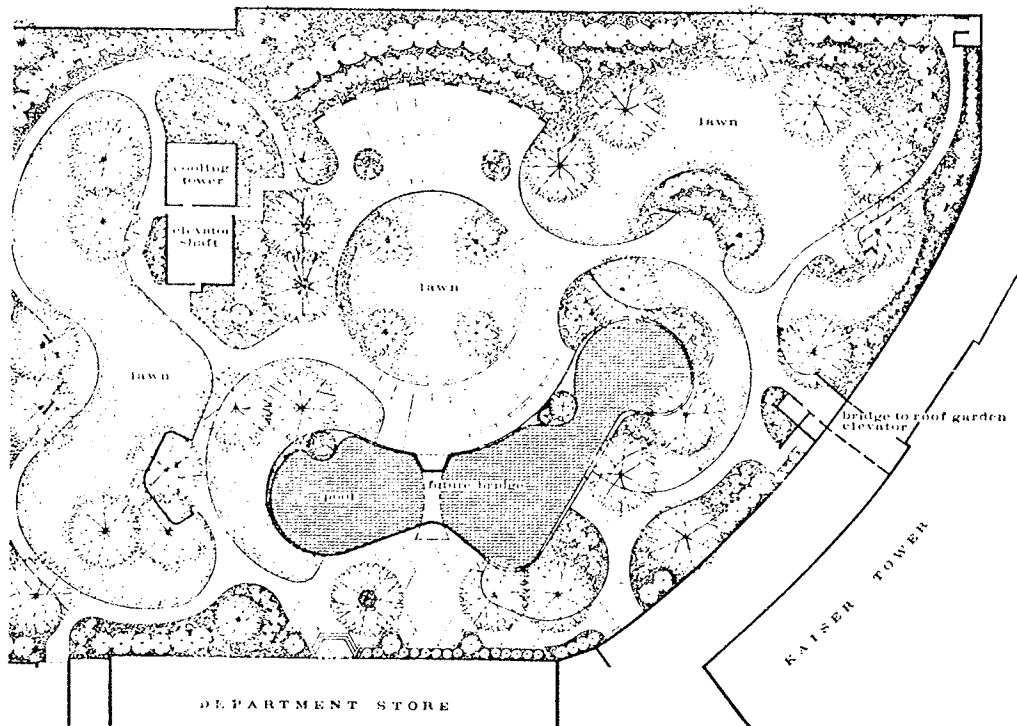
Plan of Kaiser Center Roof Garden (From "The View From Above," 1964.)
